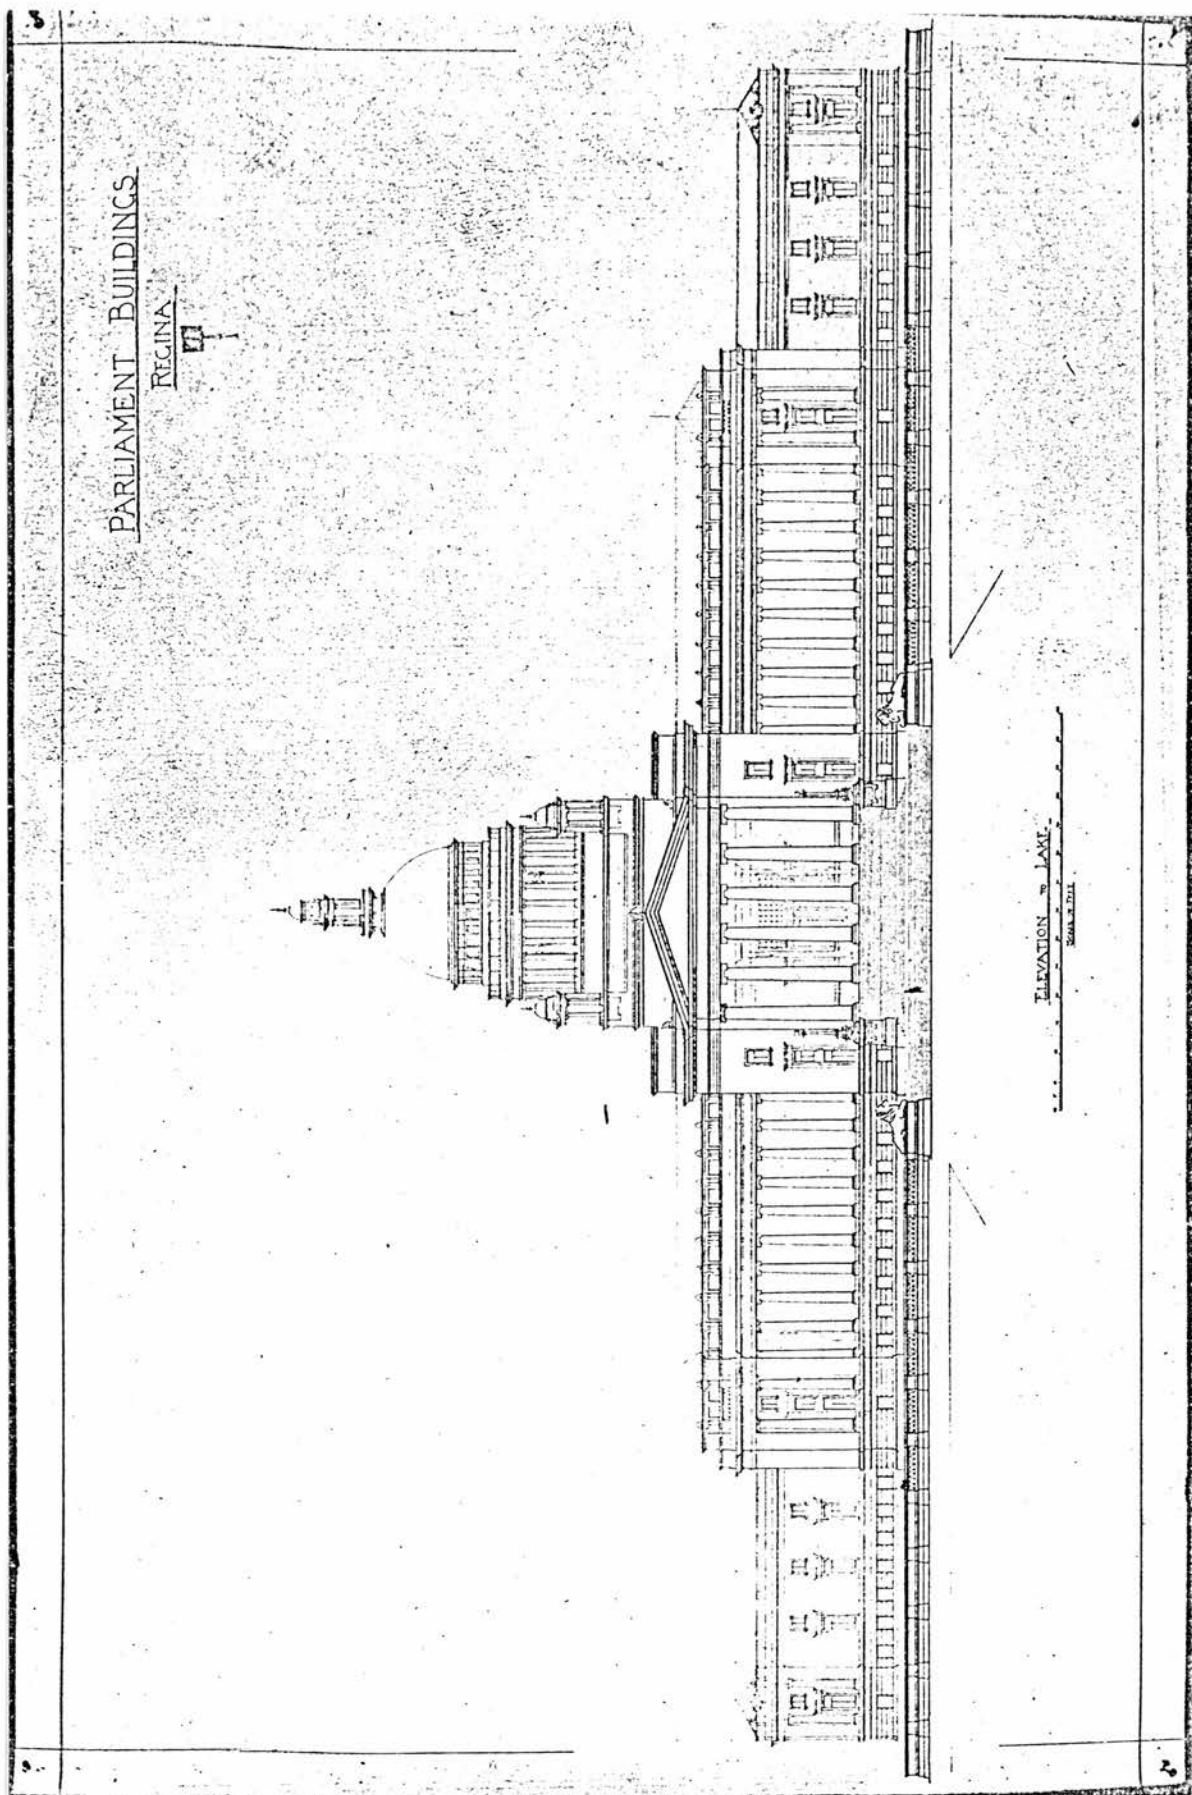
, Design for proposed Parliament Building, Regina, Saskatchewan, front elevation, Frank Rattenbury, architect, (1907).
